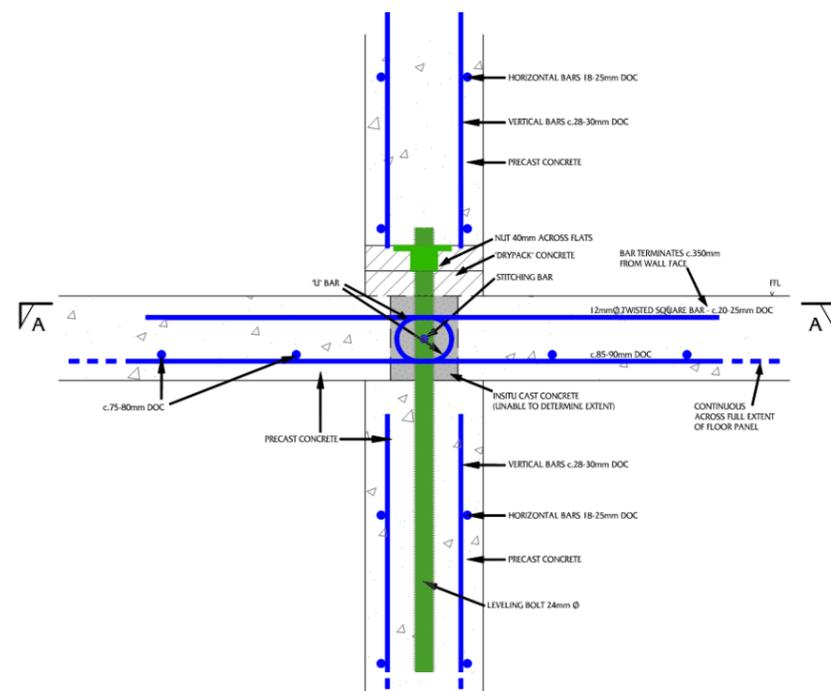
section of connection between adjacent floor panels (from GBG report)
